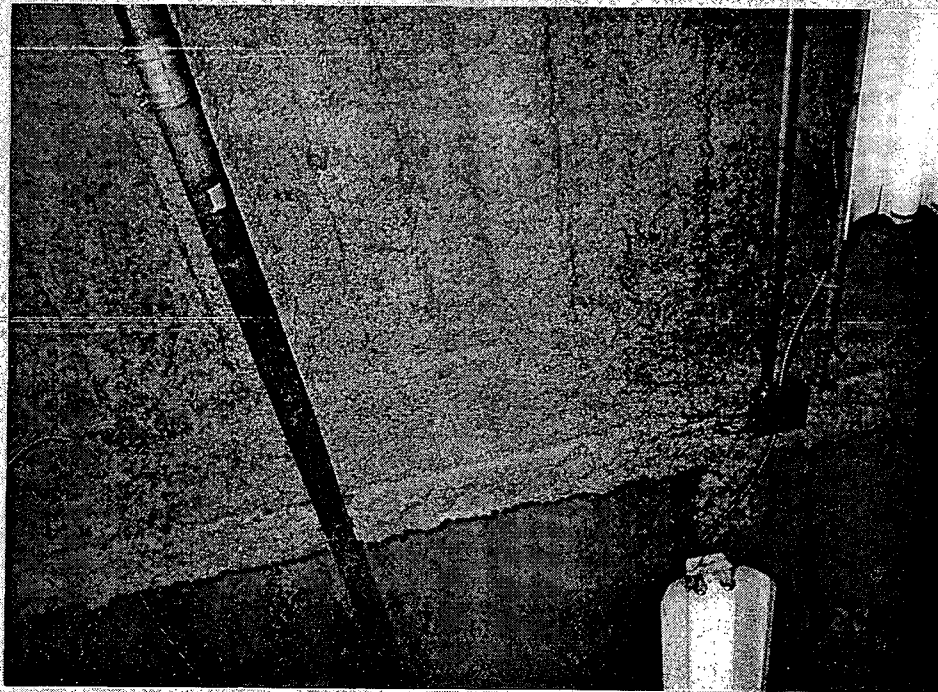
Photo shows the uncovered ceiling with spray on, non asbestos containing, fireproofing material.
